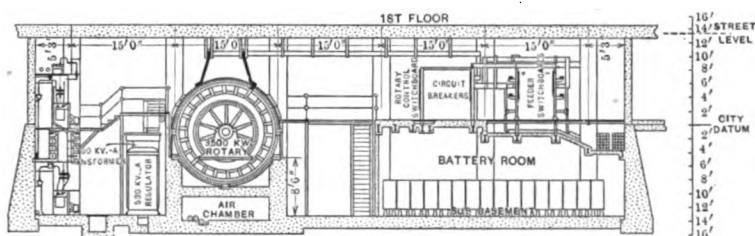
SECTIONAL ELEVATION OF SUBSTATION SHOWN IN FIG. 12
